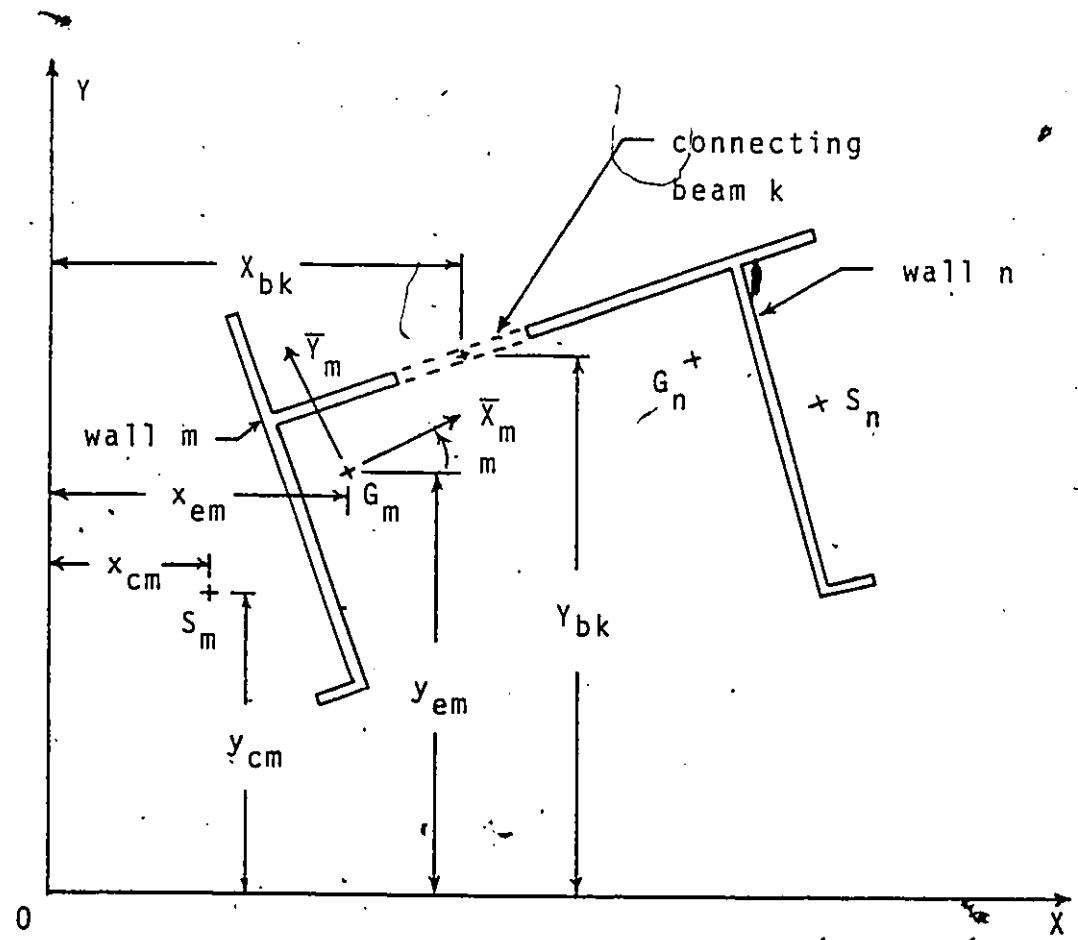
COUPLING BY TYPE 1 CONNECTING BEAMS
